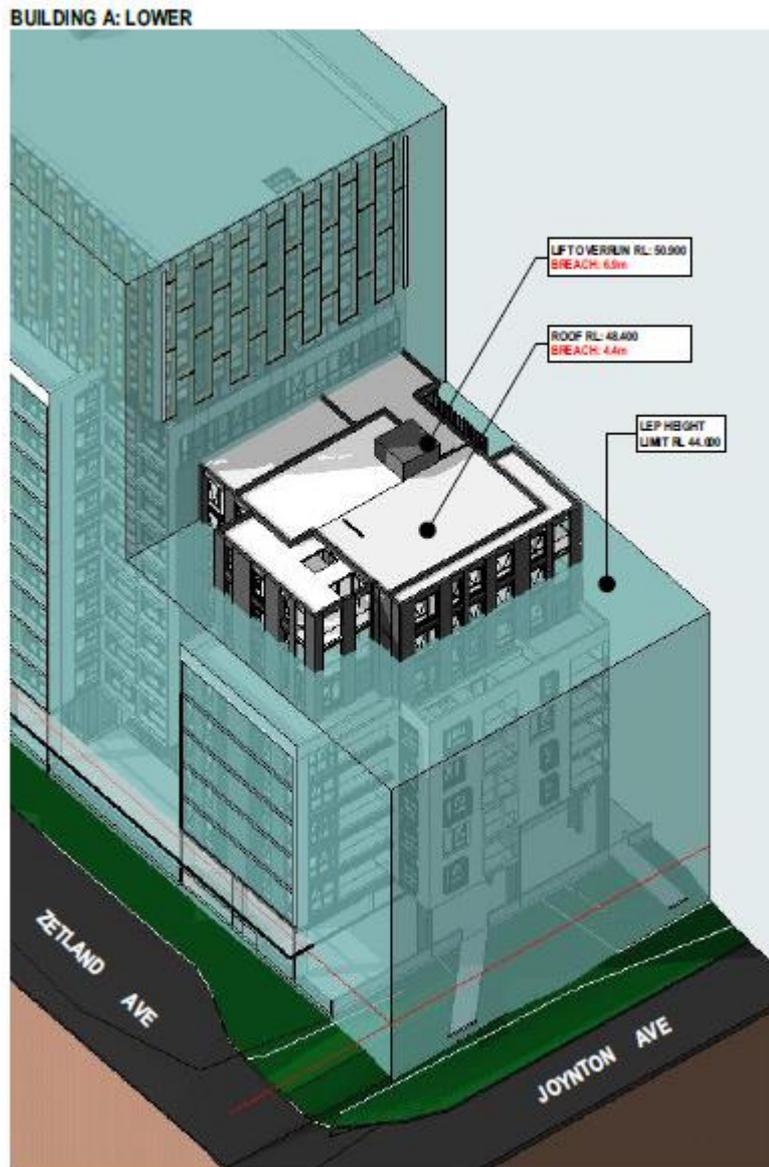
Proposed building envelope of Building A, depicting the non-compliance above the maximum 'Height of Buildings' development standard.
